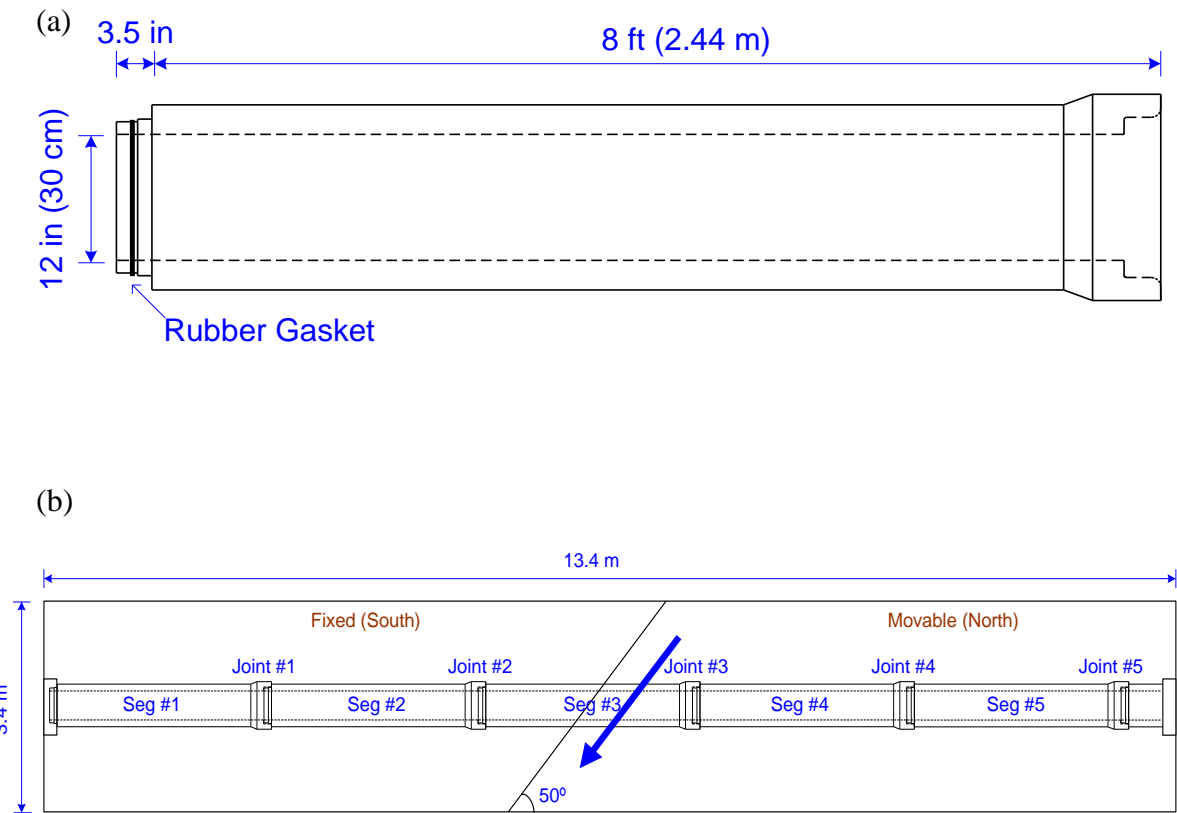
(a) Schematic of a typical commercial concrete pipe with dimensions (used in experiment #2), (b) schematic of the test basin.
